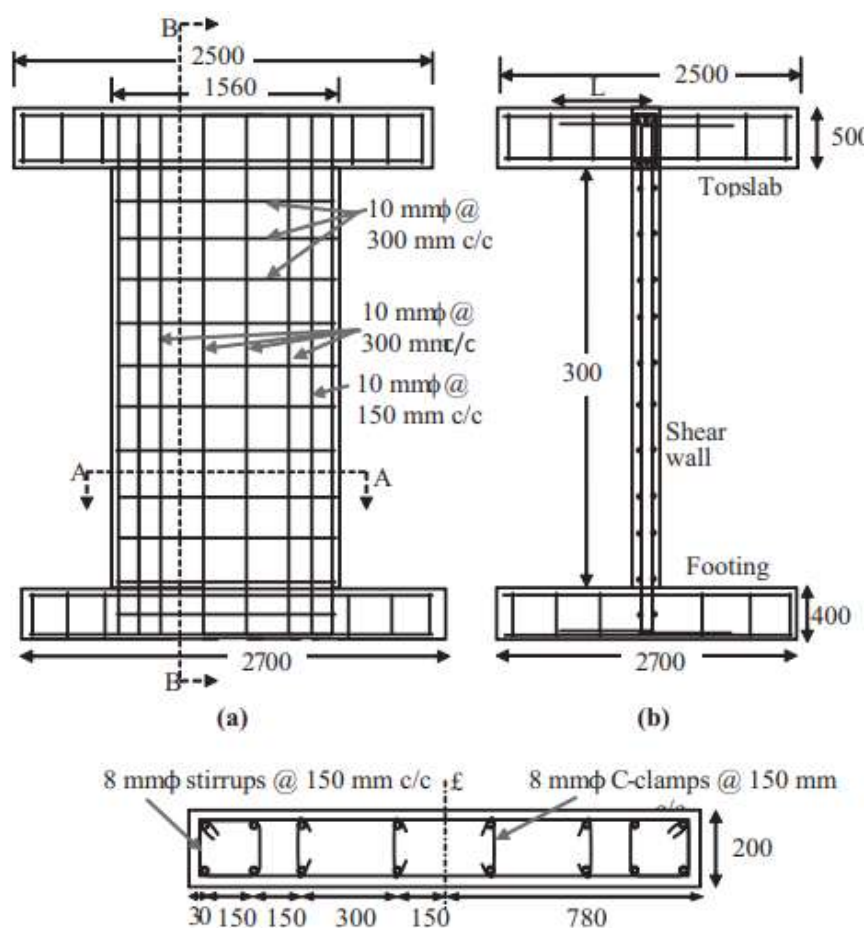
Reinforcement details of the shear wall: (a) elevation; (b) cross section view along BB; (c) plan view along AA (all dimensions shown are in mm, Drawn not to a scale) from G.V. Rama Rao (2016)[4]
